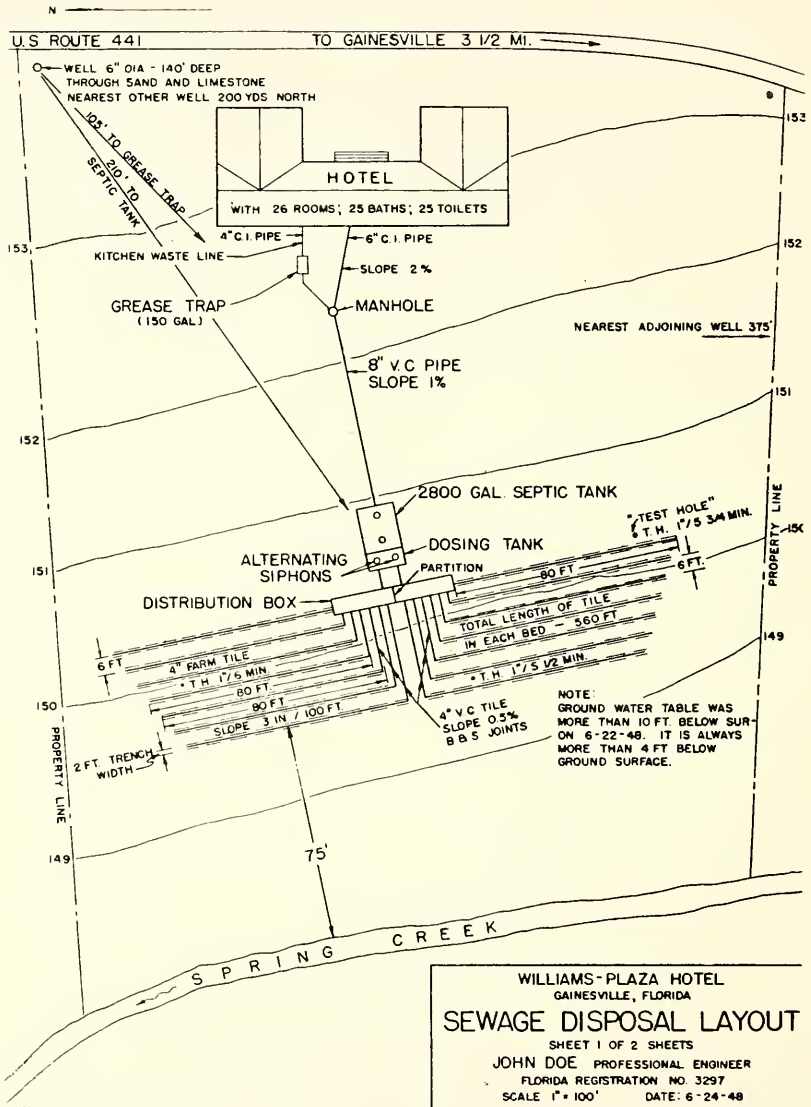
TYPICAL LAYOUT PLAN OF A SUB-SURFACE SEWAGE DISPOSAL SYSTEM
